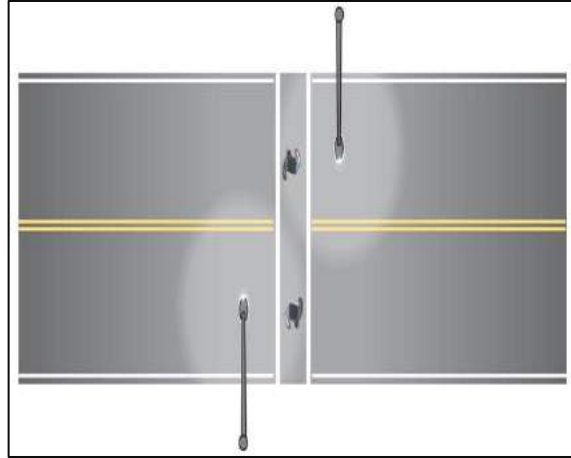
Recommended design layout for crosswalk lighting (Gibbons et al. 2008).
